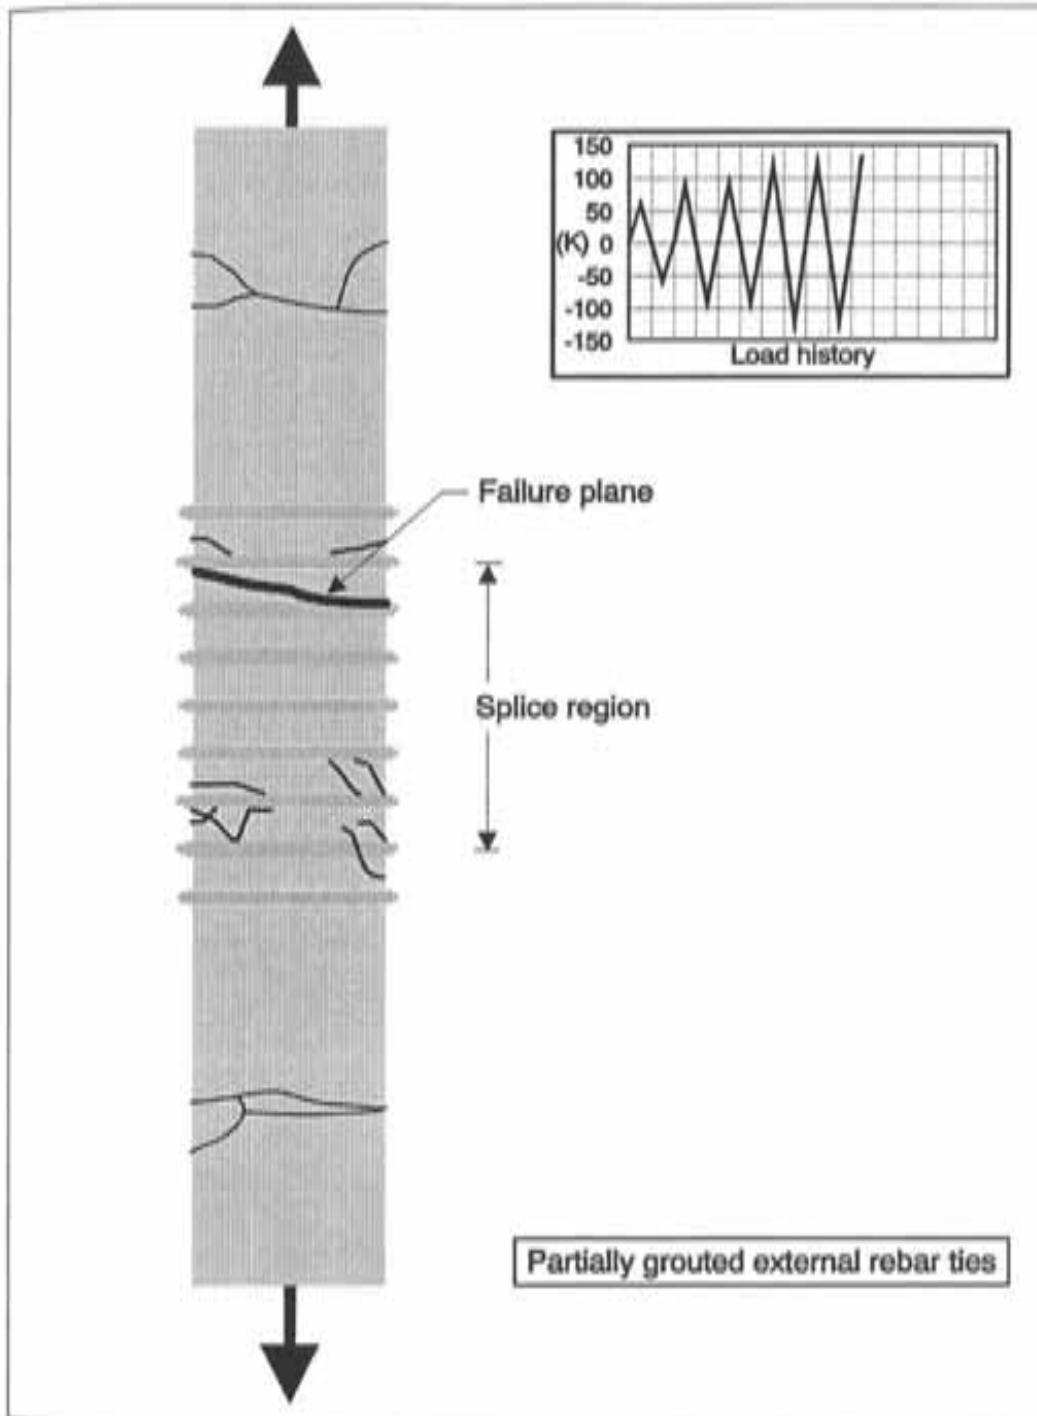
Crack pattern in specimen U-ES3-PG-3 at failure
